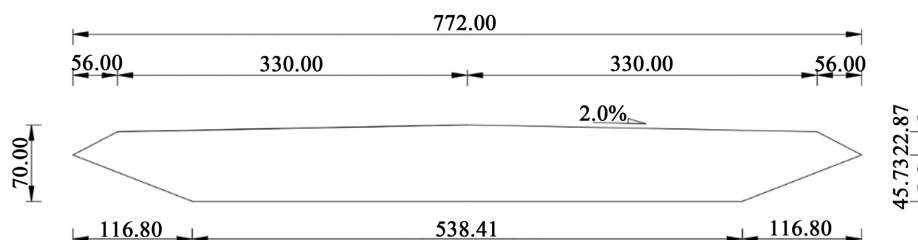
Dimensions of the main beam section after scaled down (unit: mm)
